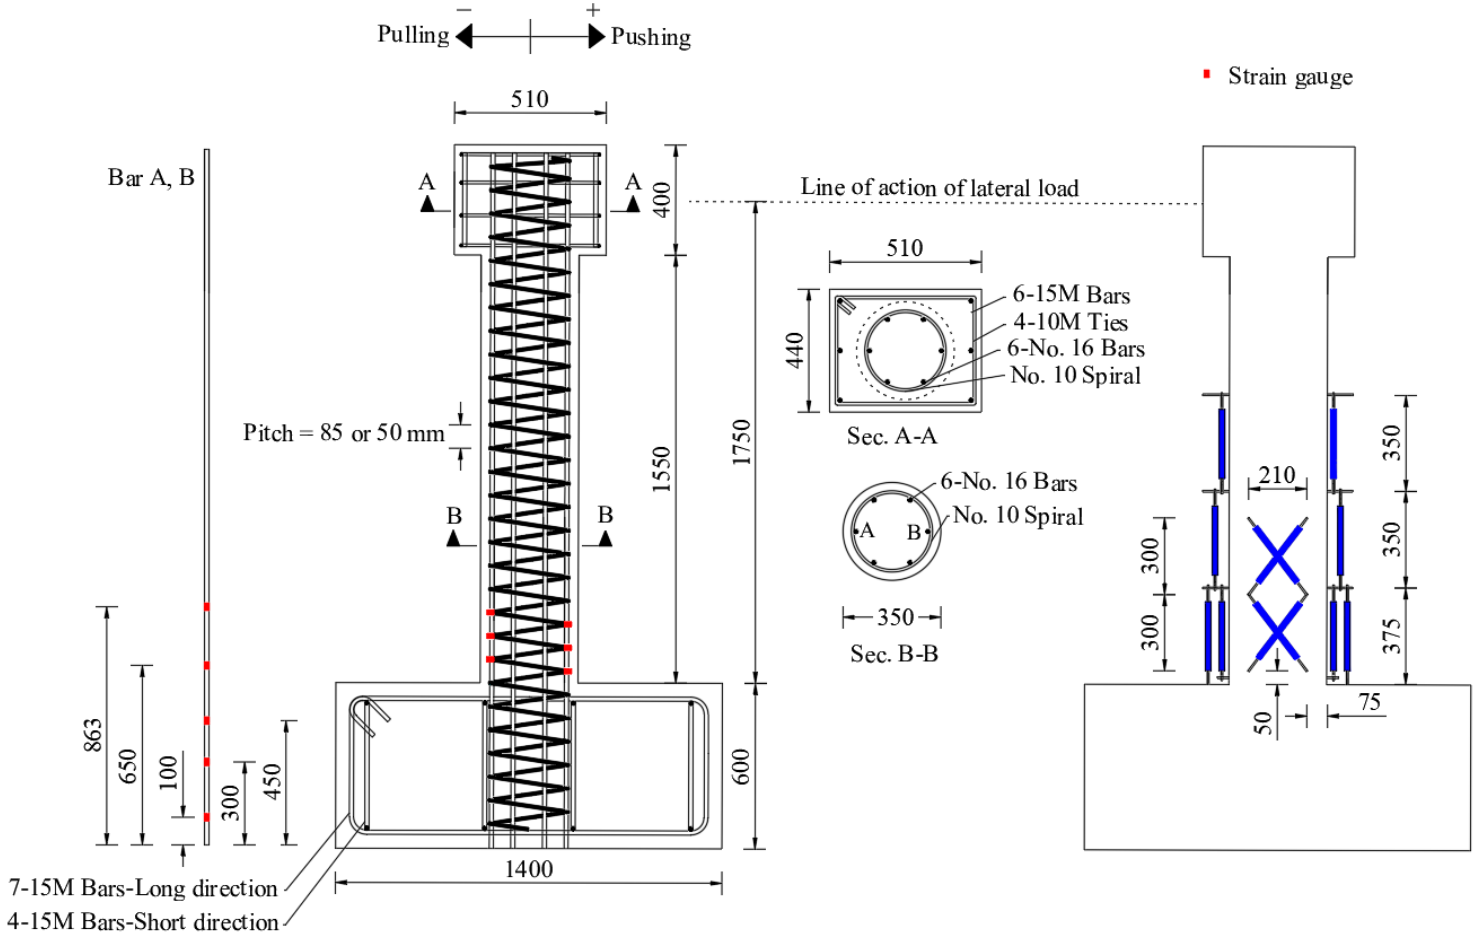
Details of specimens S1 and instrumentation (all dimensions in mm)
